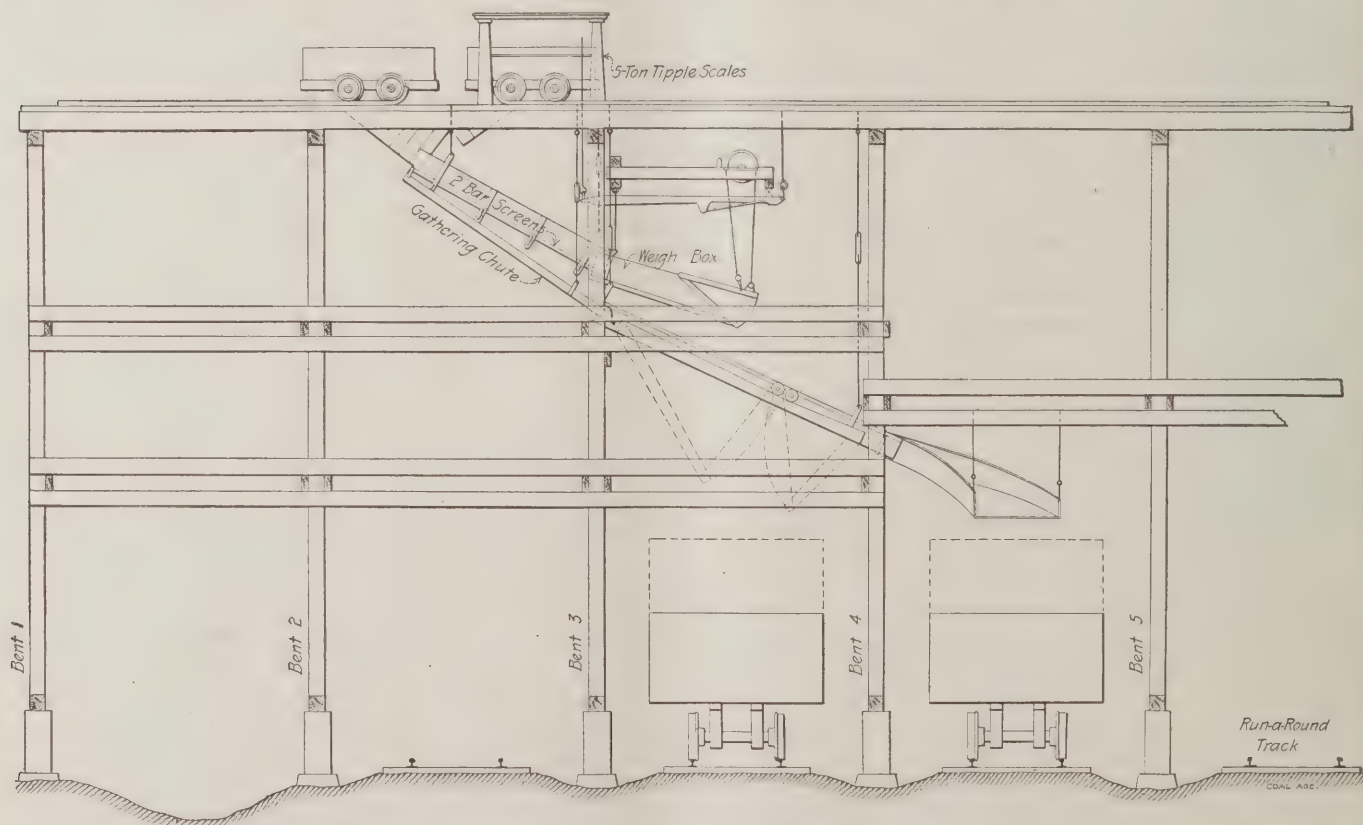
SIDE ELEVATION, SHOWING MINE-RUN DUMP AND LOADING CHUTES
